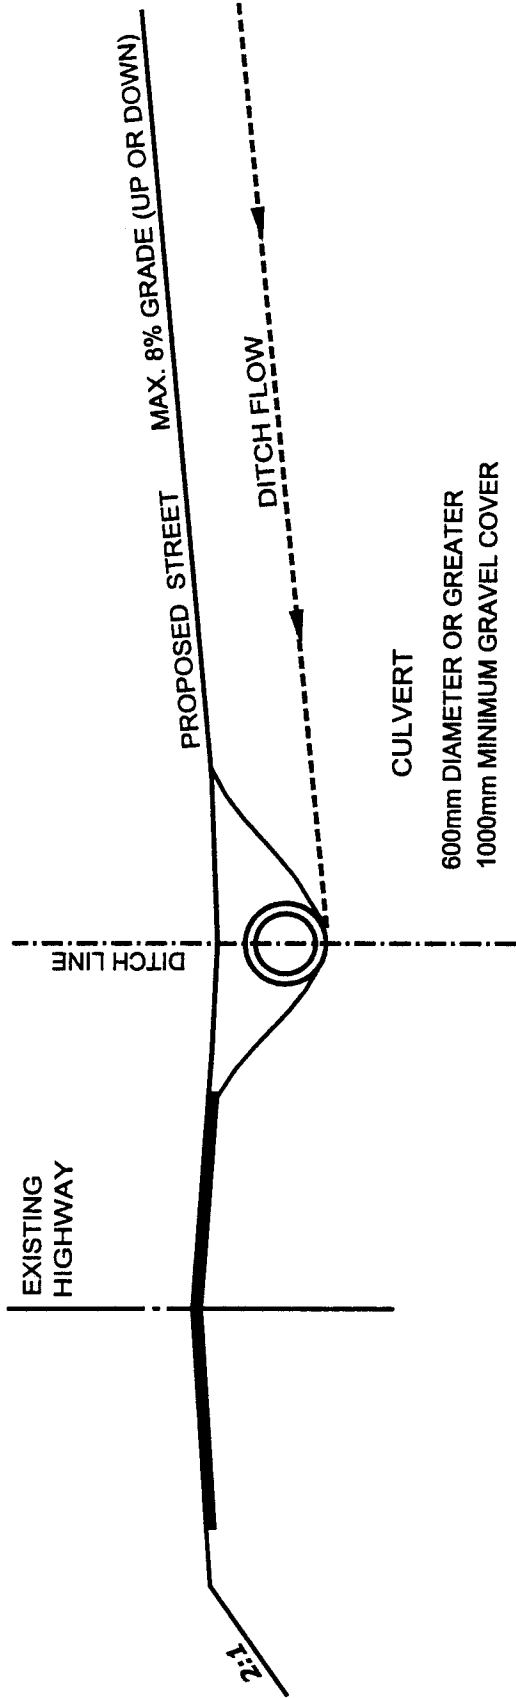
A: TYPICAL CROSS SECTION OF NON-CURBED LOCAL HIGHWAY, SHOWING THE MINIMUM REQUIREMENTS FOR OPEN DRAINAGE DITCHES.
